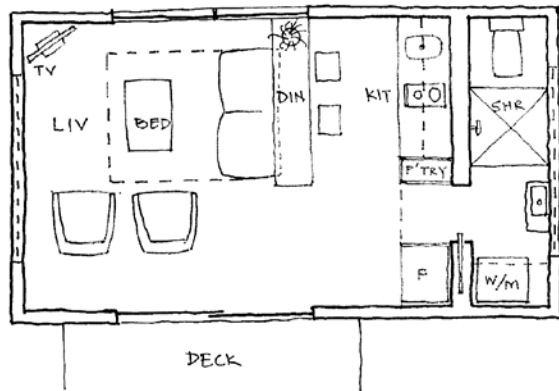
Floor Plan with Sofa Bed and Bench for Dining
